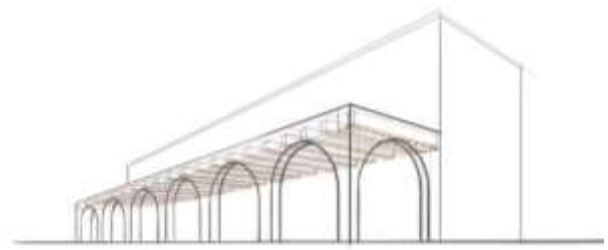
Composition of wooden beams in the archetypal arcade, represented in a two-point perspective on the section of wooden beams in colonial arcade porches, very common in New Spanish architecture
